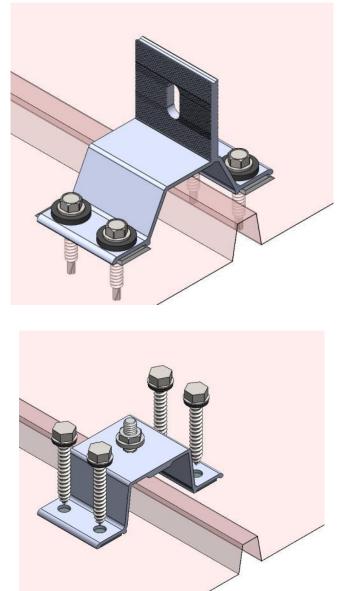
Top- Giraffe Mount (self-drilling screws shown), Bottom- Rhino Mount (2" lag bolts shown)
